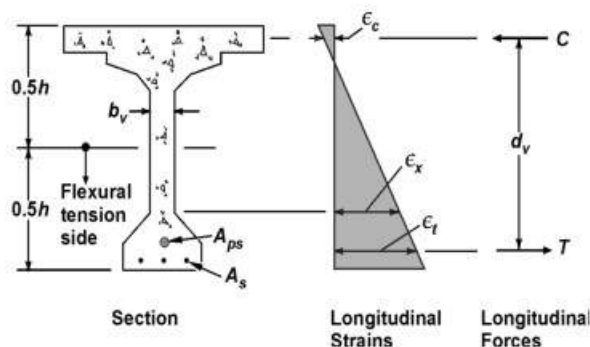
Longitudinal Strain, ϵ_x , for Sections Containing Less than the Minimum Amount of Transverse Reinforcement
